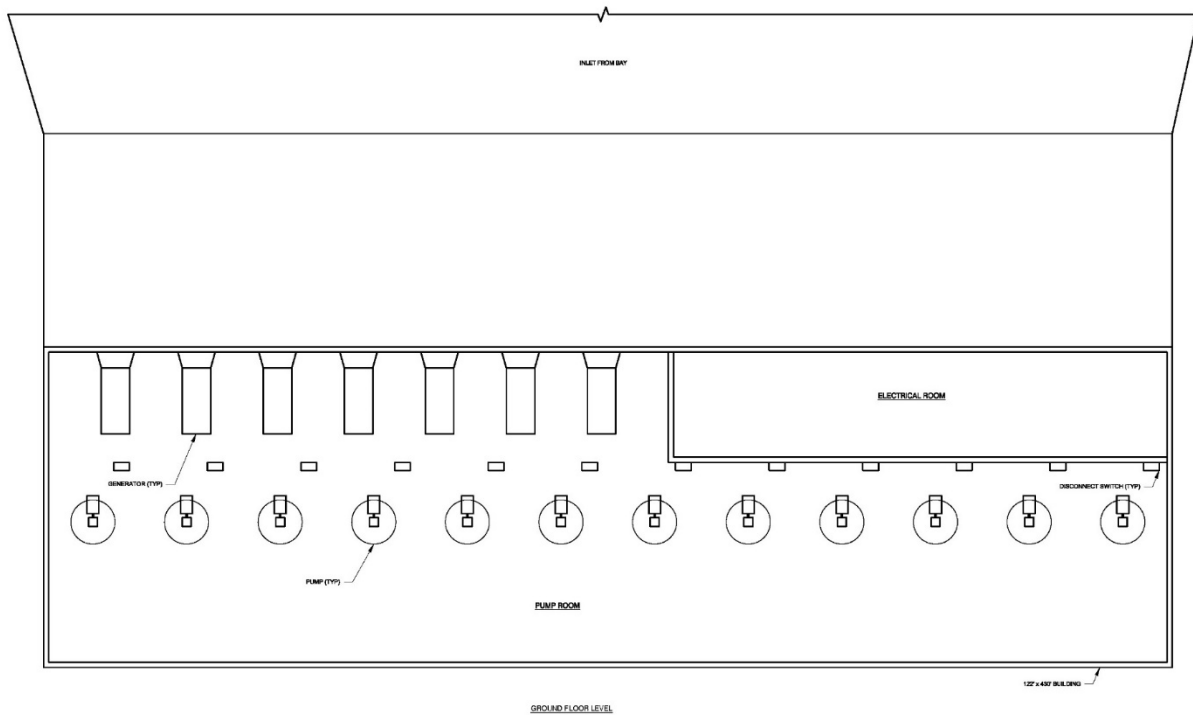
Conceptual layout of the ground floor level of the Pump Station Alternative.
